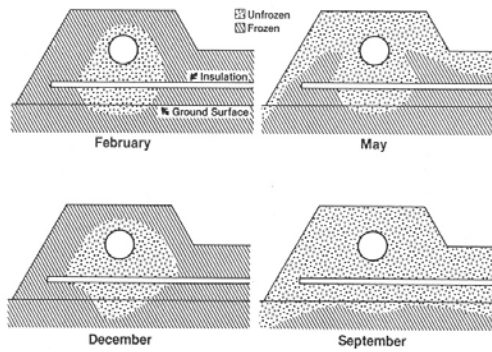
Thermal History. Uninsulated pipe in insulated embankment.
